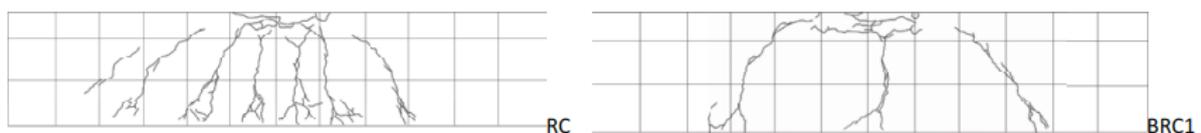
Cracking pattern of steel and bamboo reinforced beam [11, p. 2969]
